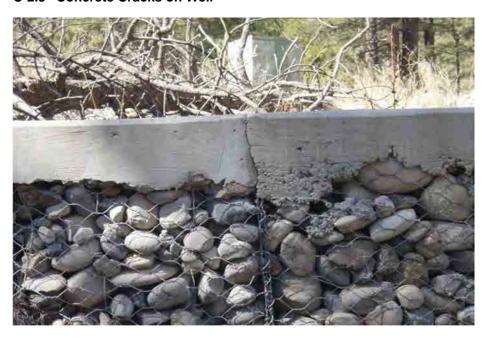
March 2016 — Cracks are consistent with previous inspection. Recommend monitoring.
